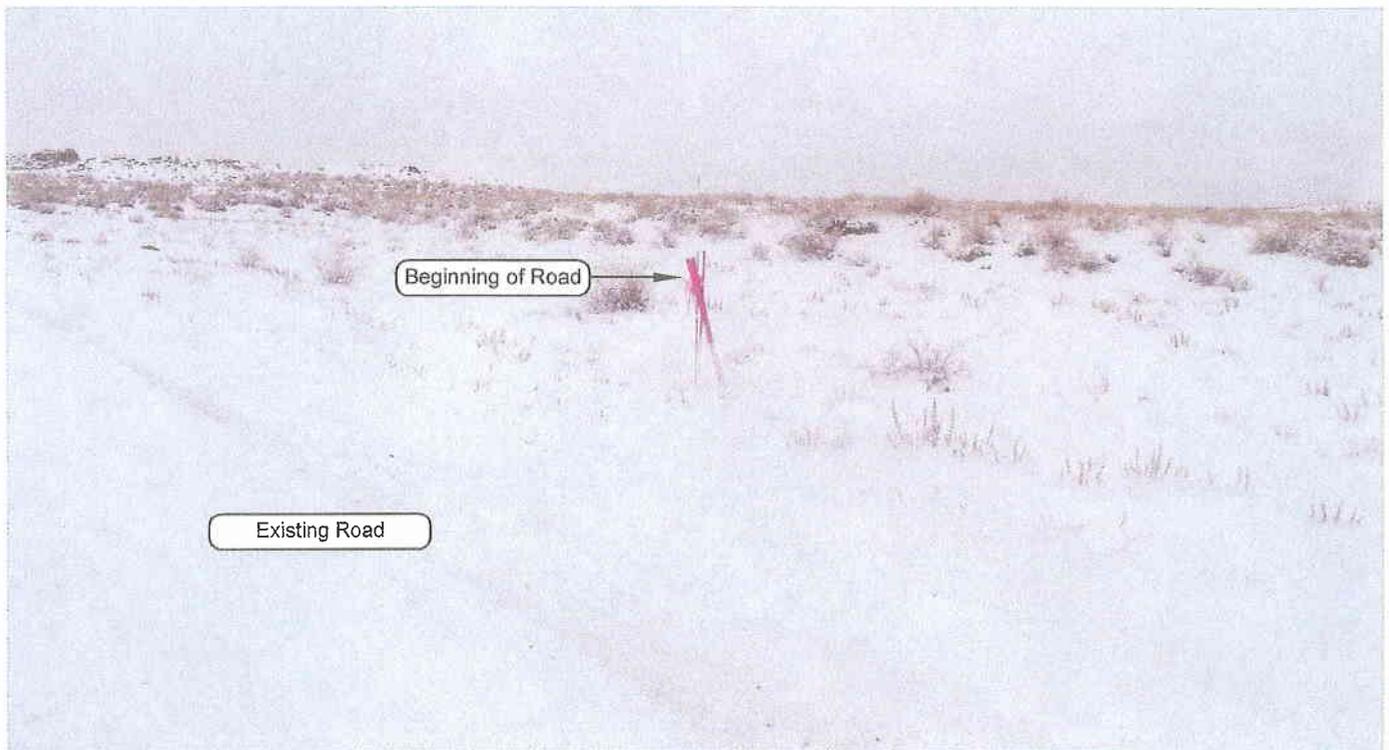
PHOTO VIEW: FROM EXISTING ACCESS ROAD
